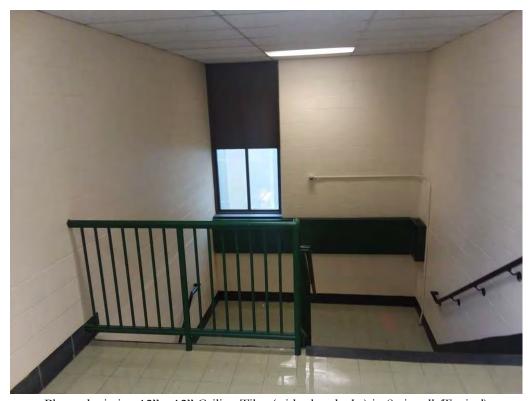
" x 12" Ceiling Tiles (with glue daubs) in Stairwell (Typical)
